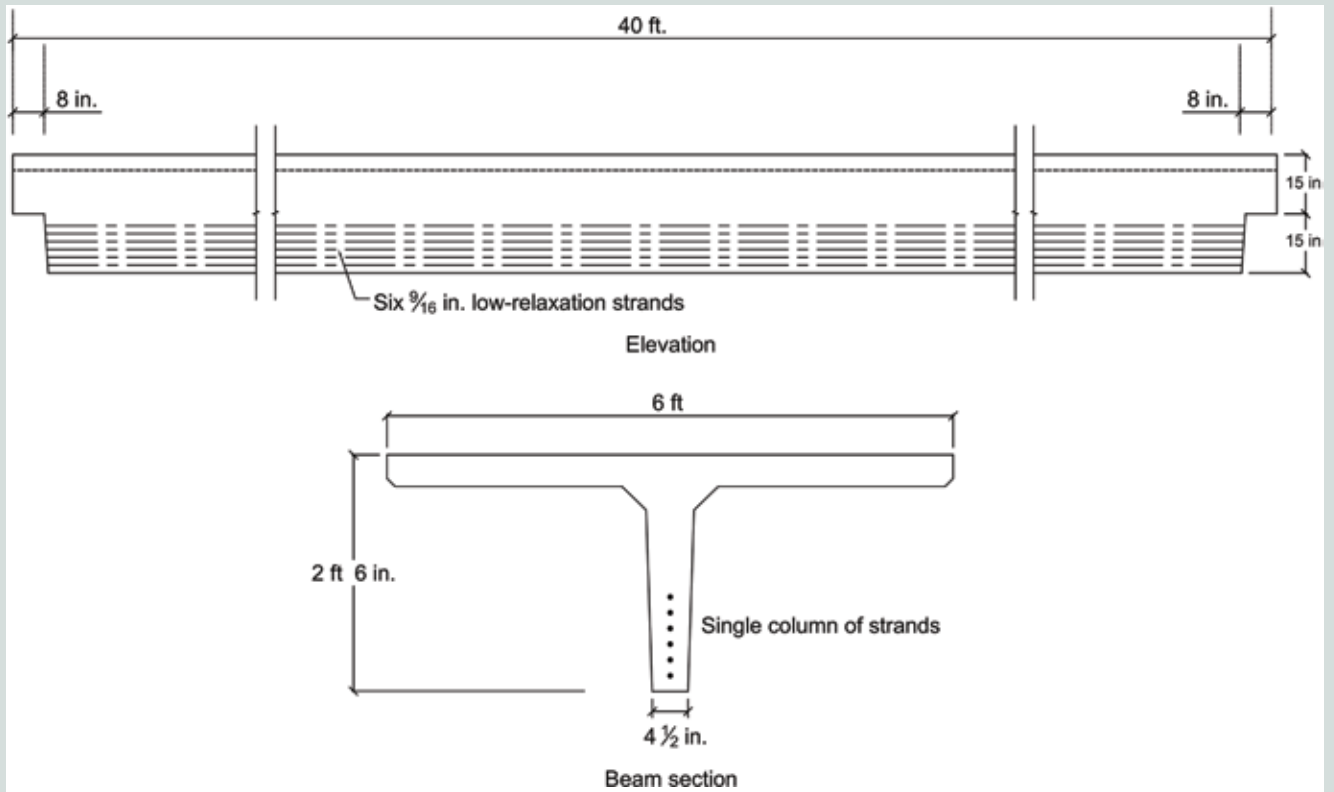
Elevation and cross section of test specimens. Note: 1 in. = 25.4 mm; 1 ft = 0.305 m.
